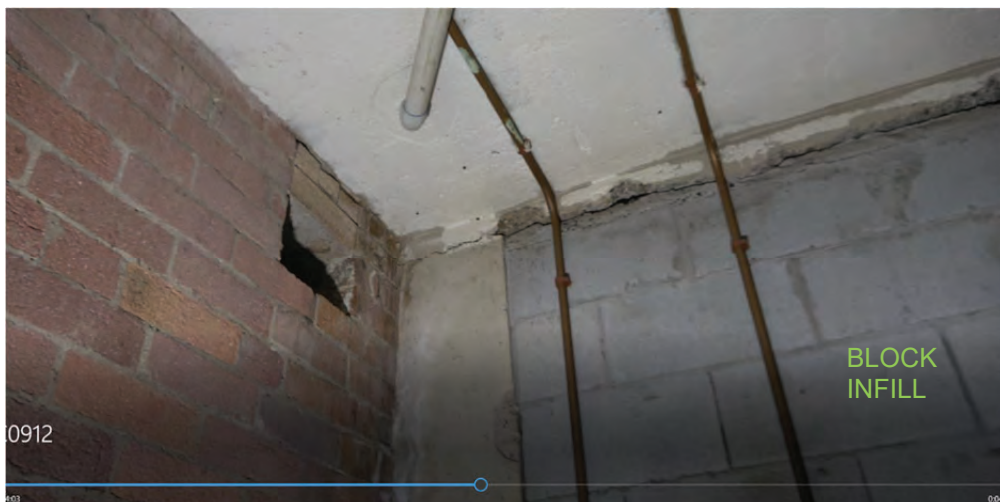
At 3-H/J Note cracking along top of what's left of the rear concrete retaining wall.
